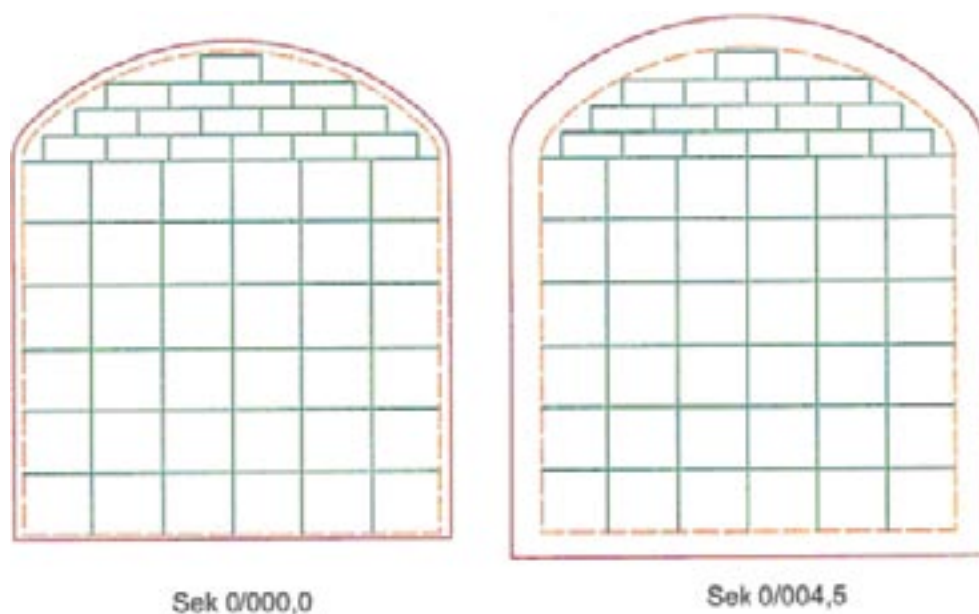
Cross sections of tunnels with “static” stacking with as low as 60% average degree of block filling.
